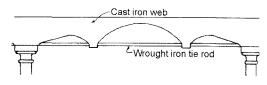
1960) Composite cast and wrought-iron girder (Condit, 36)
